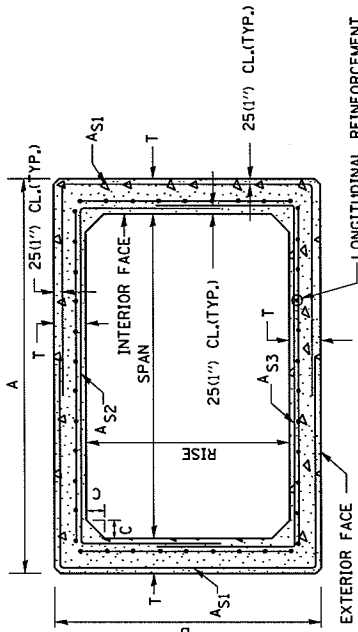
DETAIL OF PRECAST CONCRETE BOX CULVERTS AND END SECTIONS
